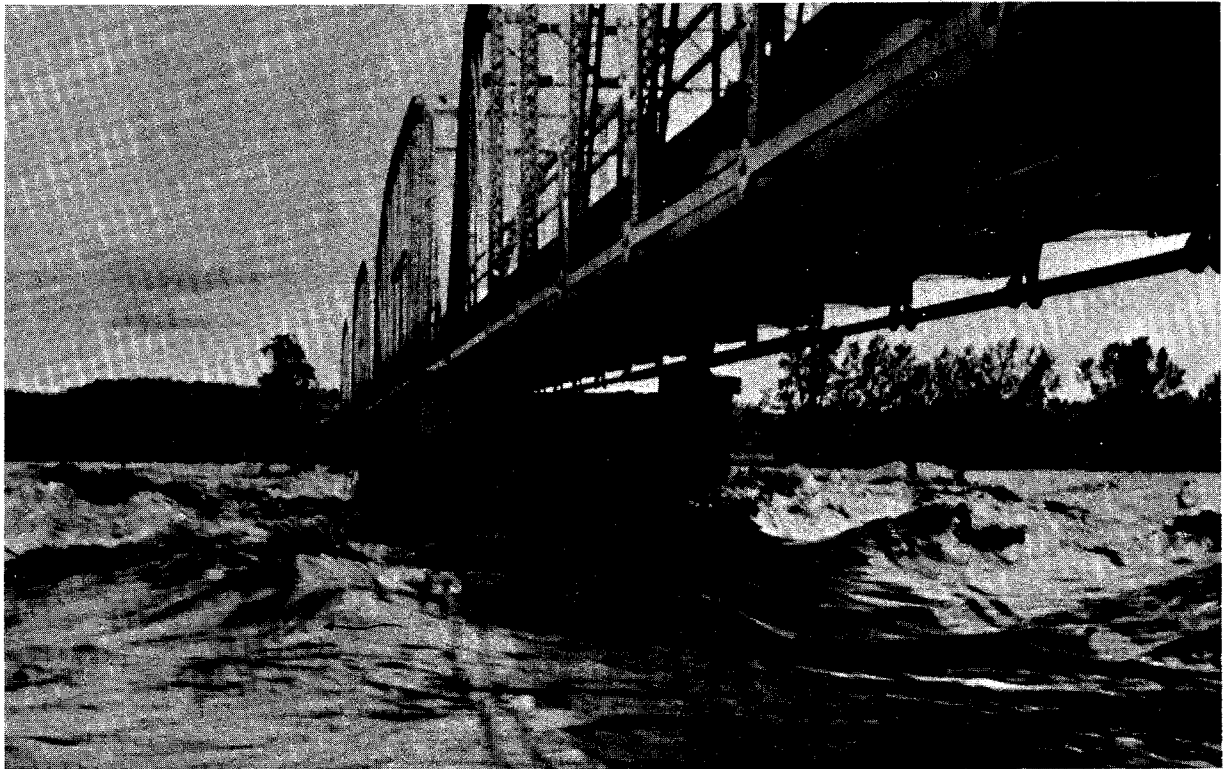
Flood of May 5, 1941 at US-75 truss bridge, built in 1919. Note pileup of water at upstream face of pier.
